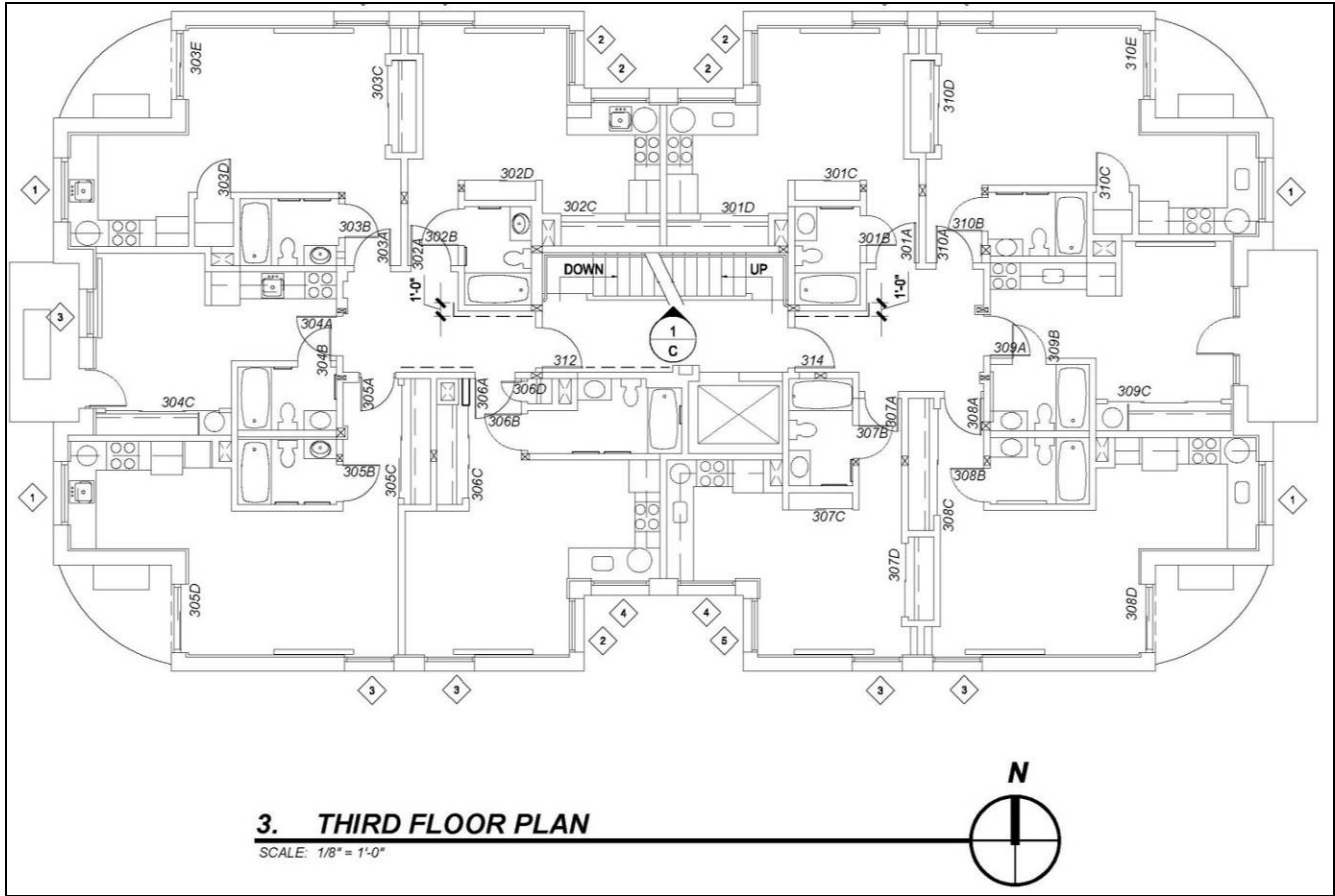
Current Floor Plans, Floors 3 – 6, Typical Plan, Hanthorn Apartments
